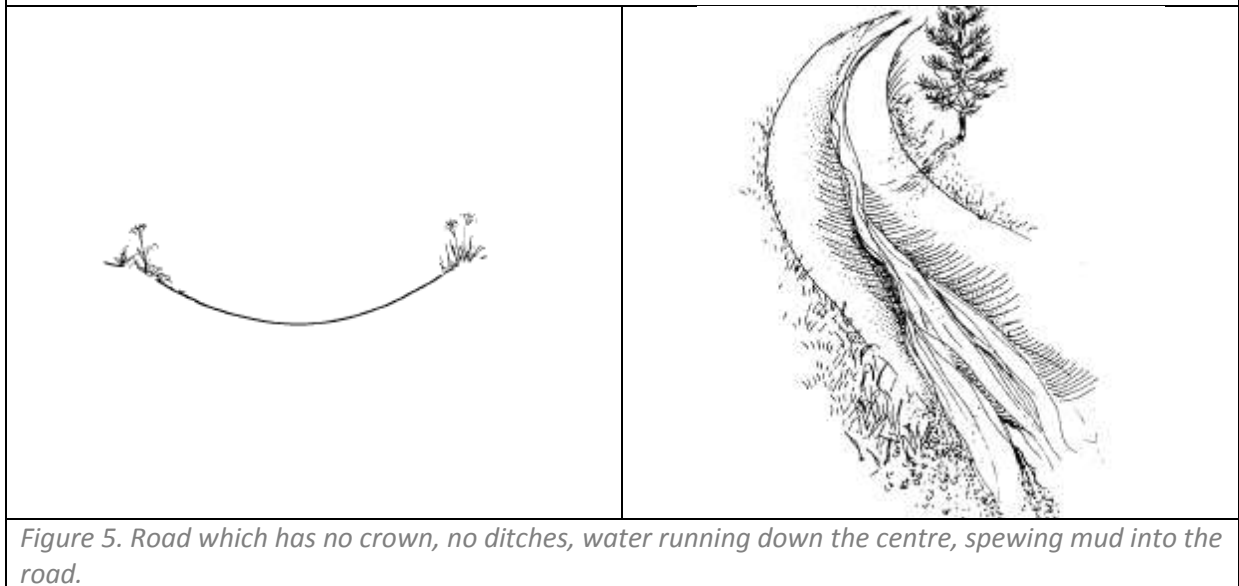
Road which has no crown, no ditches, water running down the centre, spewing mud into the road.
